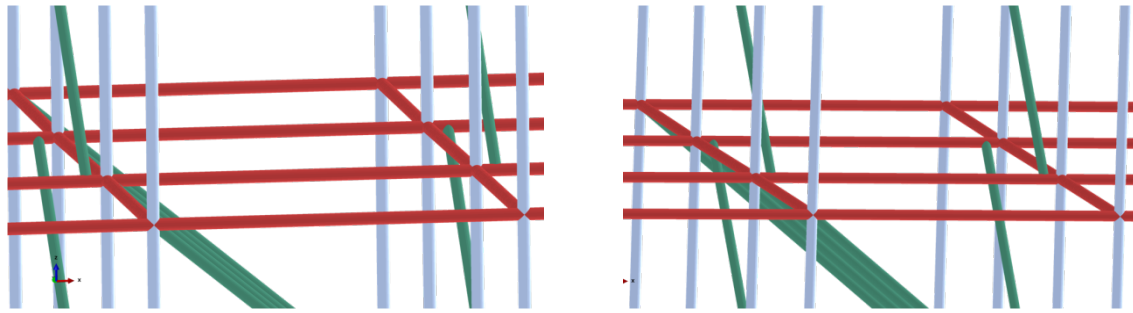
Outside (Left) and inside (Right) positioning of the brace elements.
